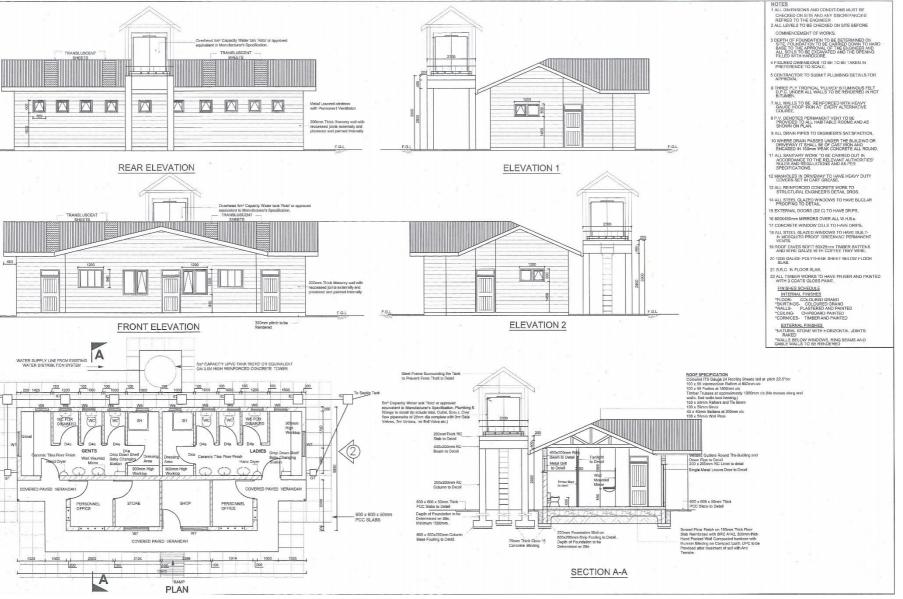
Typical Plan, Views and Sections of an Ablution Block
